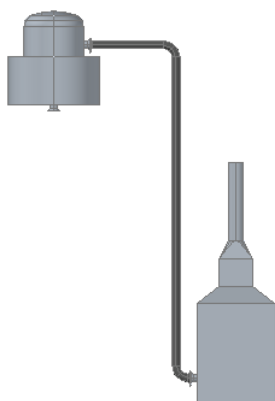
Pipe added between outlet nozzle of the Centrifugal Pump1 and inlet nozzle of the Low Pressure Heater
